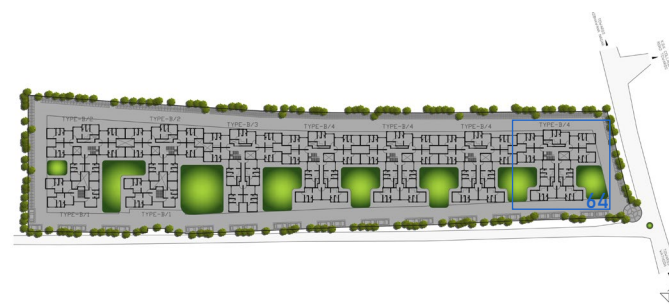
Wathoda construction site. Plan downloaded from NIT website
